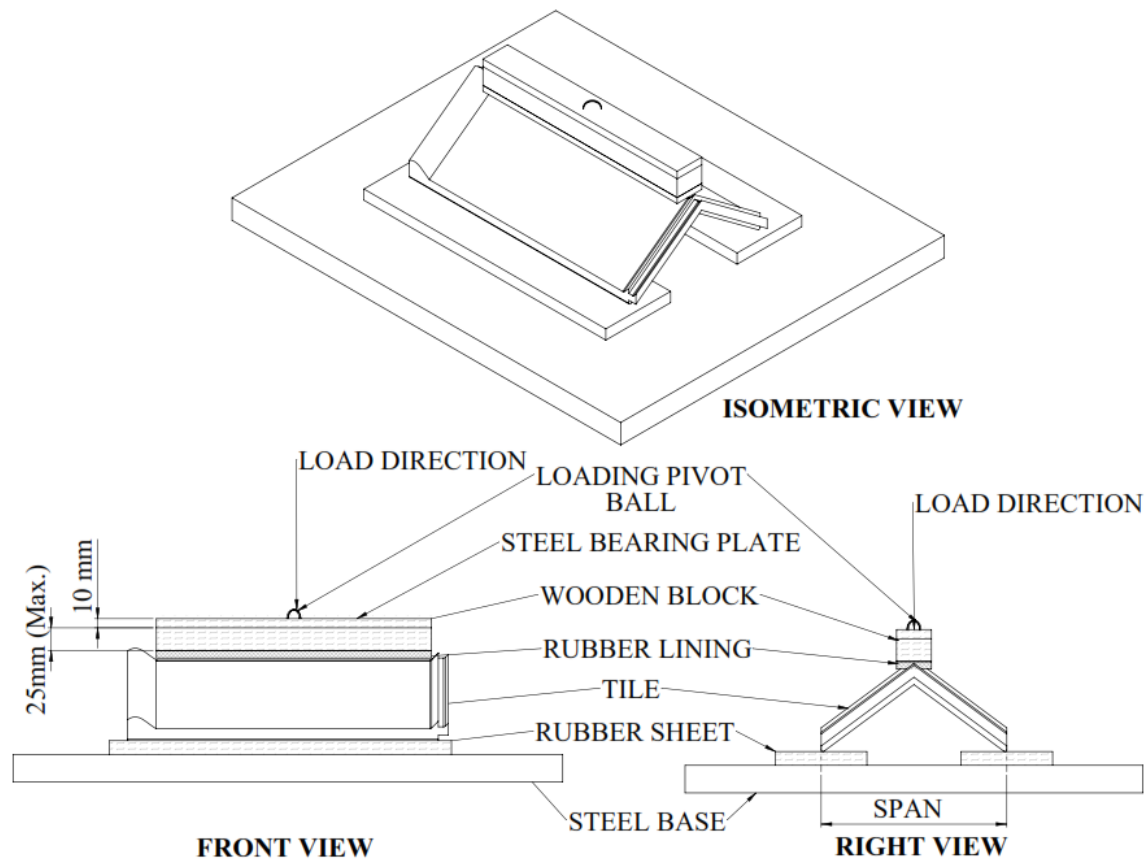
Test assembly for load bearing test (Loading and supporting members made of hard wood)
